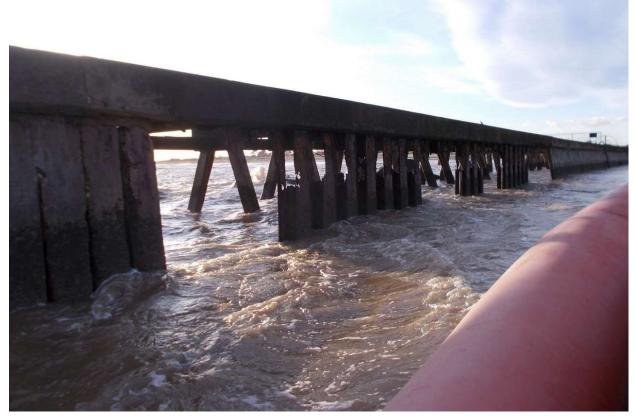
Length C corroded steel sheet piles and unsupported front beam.
